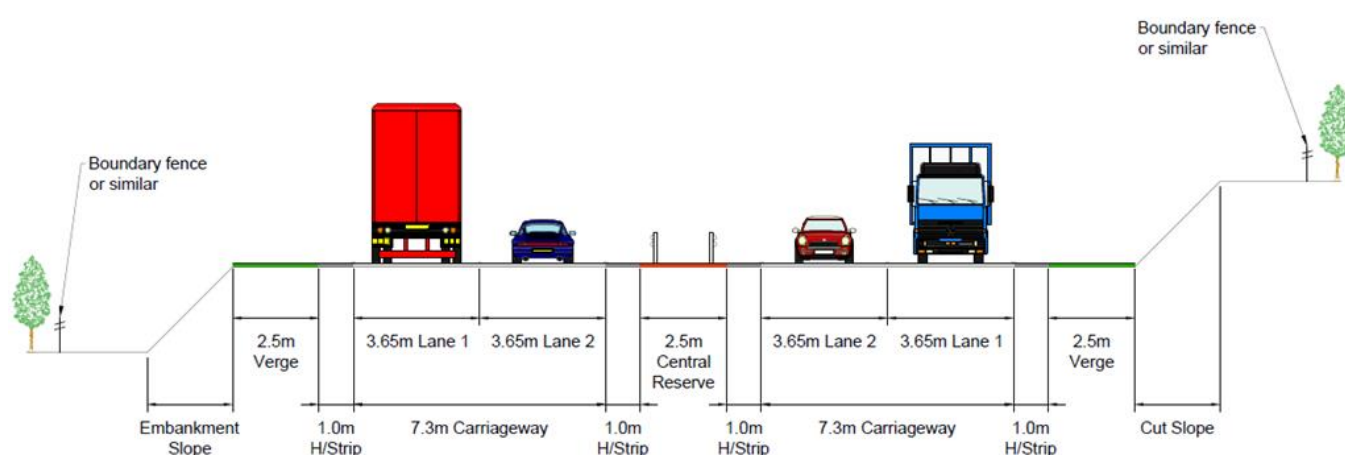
Dimensions of cross-section components for rural all-purpose dual carriageway roads mainline (CD127).
